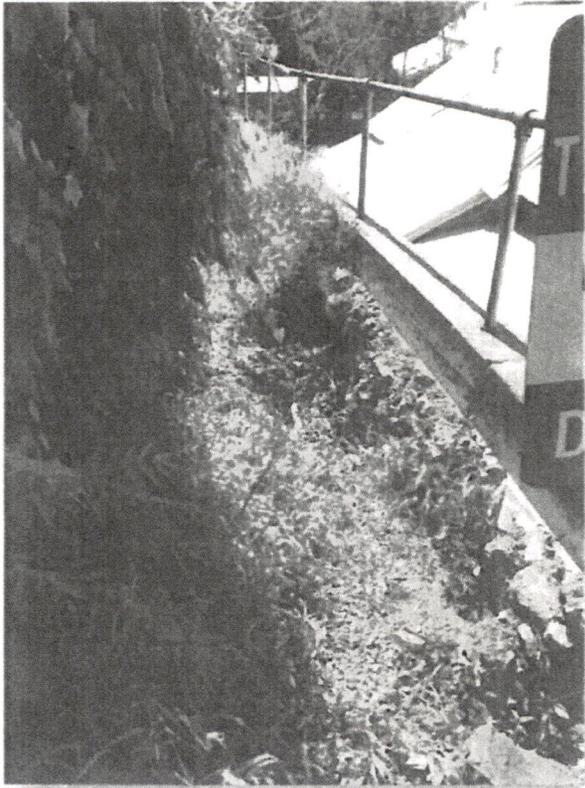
Concrete retaining wall adjacent to wood frame residence
